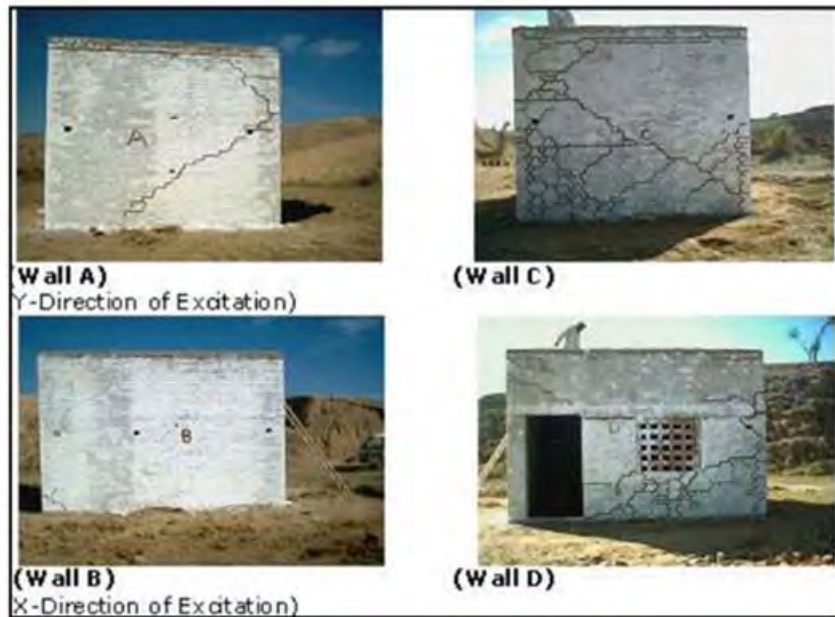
Damage Mechanism of Tested Building Model (Ali et. al., 2012)
